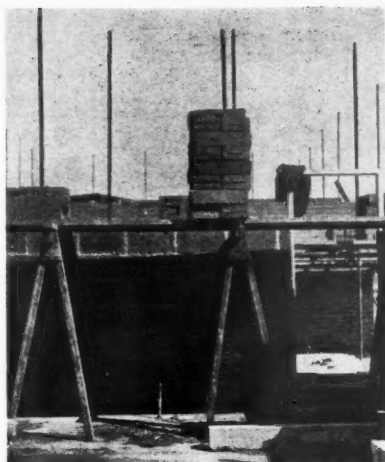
Lightweight building blocks as inner leaf of walls ('Brick-Modern' House)
